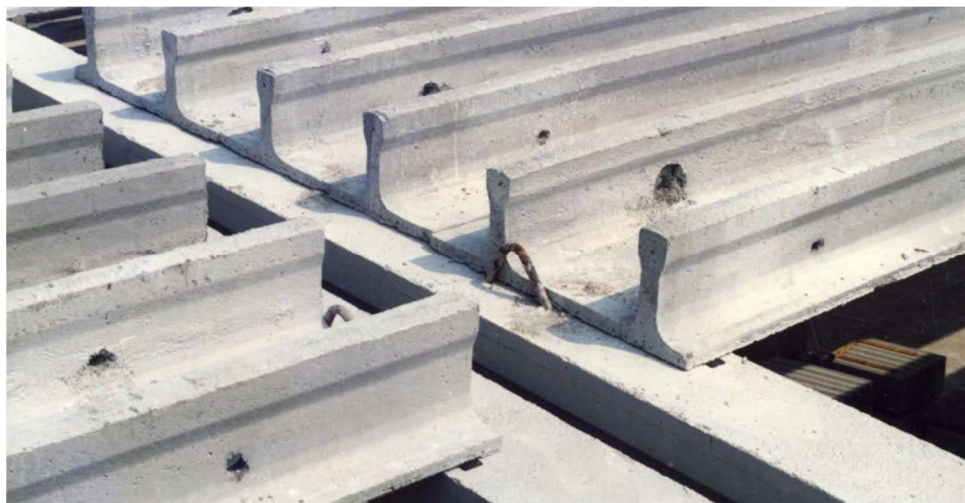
Inverted double tee slabs (Nordimpianti System Srl, n.d.)
